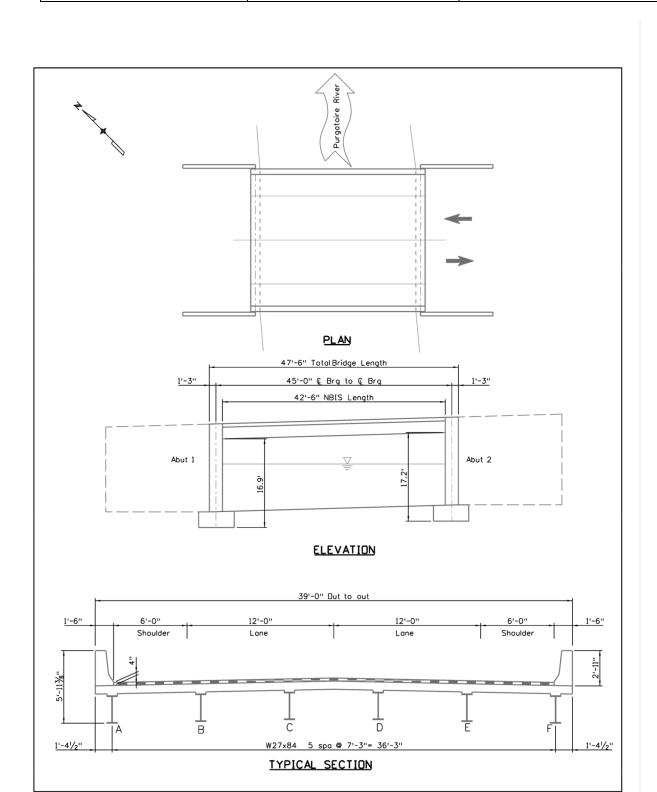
Bridge Inspection Sketch – Example 5
